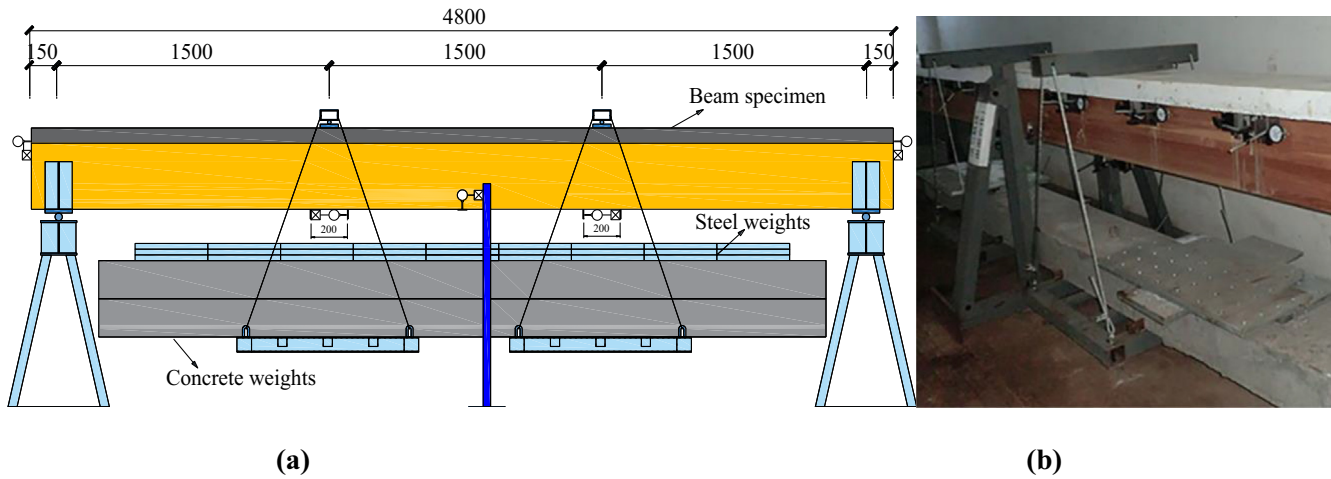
Long-term loading diagram: (a) elevation (Unit: mm), (b) the photo of a tested specimen.
